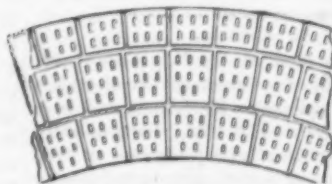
HORIZONTAL SECTION THROUGH A B.
